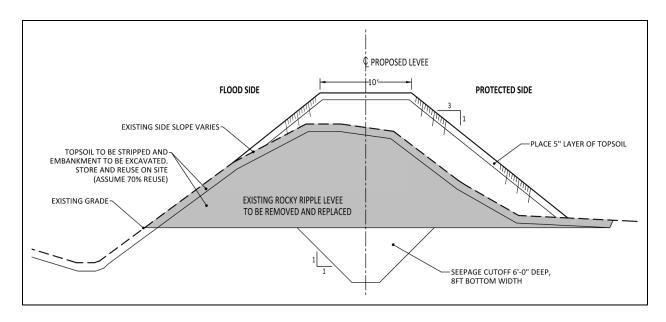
Typical Levee Section (Assuming Removal of Existing Levee)
